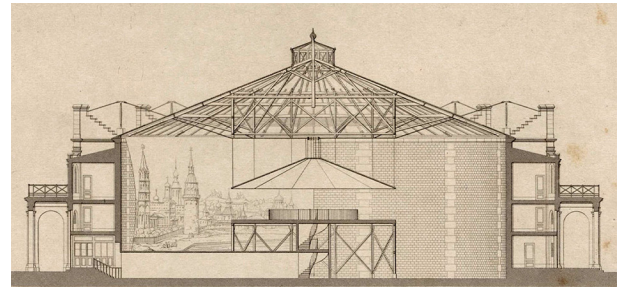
Section of the Champs Elysées 'Panorama' [Hittorff 1842, Planche 2]
